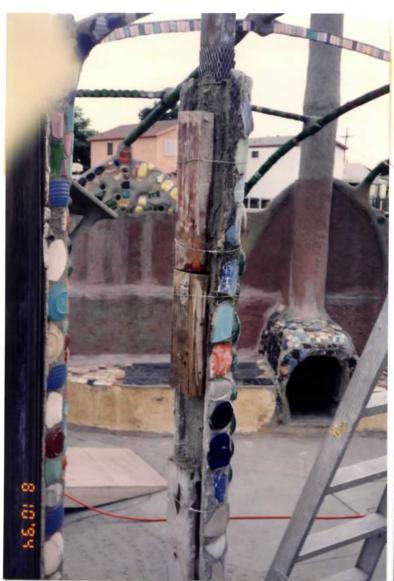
Post 04 east of house foundation during conservation after removal and replacement of failed reinforcement and installation in adequate foundation. August 10, 1994.
